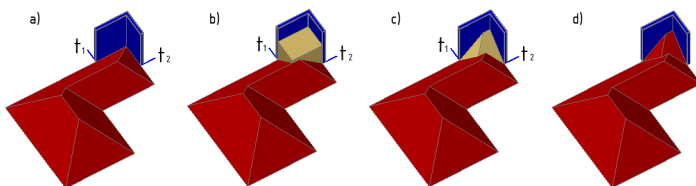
Shaping the model of the roof spanned over the adjacent building
